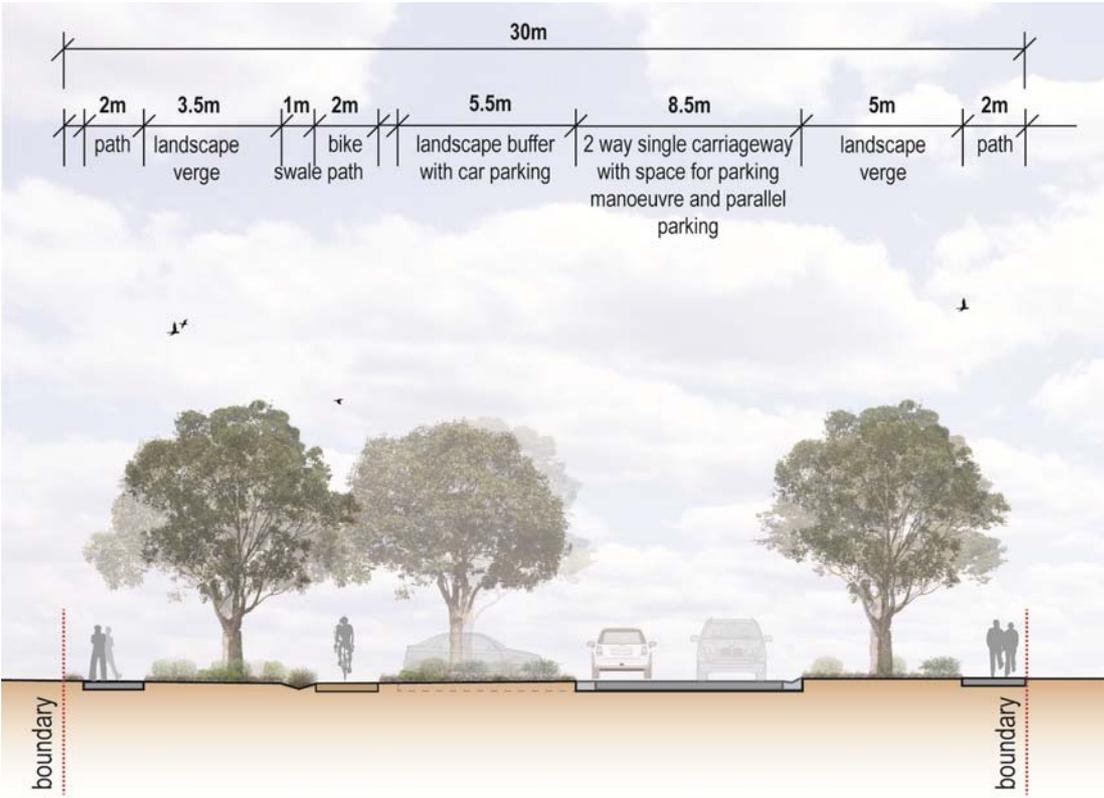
Sixteenth Street Greenway concept – Mildura South (Sixteenth & Deakin West) Development Plan
